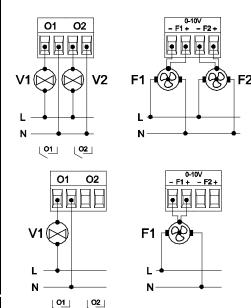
(From up to down and from left to right) Terminal block 1 and 0-10V outputs wiring examples for two valves, two fans, one valve and one fan.
